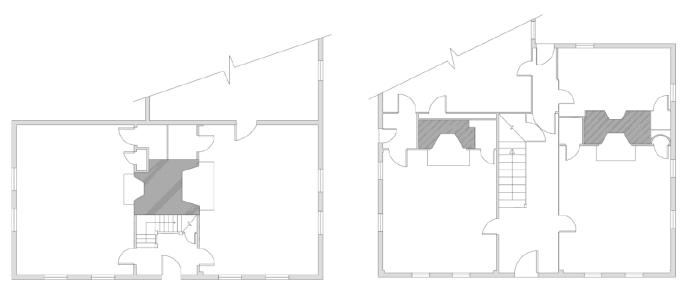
Around the 1740s, the center-passage plan (right) began to appear in dwellings built by the wealthy elite of the Connecticut River Valley as an alternative to the traditional center-chimney plan (left) commonly used in dwelling-house construction. The center-passage plan created a space that not only accommodated a straight-run stair, but acted as a buffer between public and private spaces within the dwelling house.
